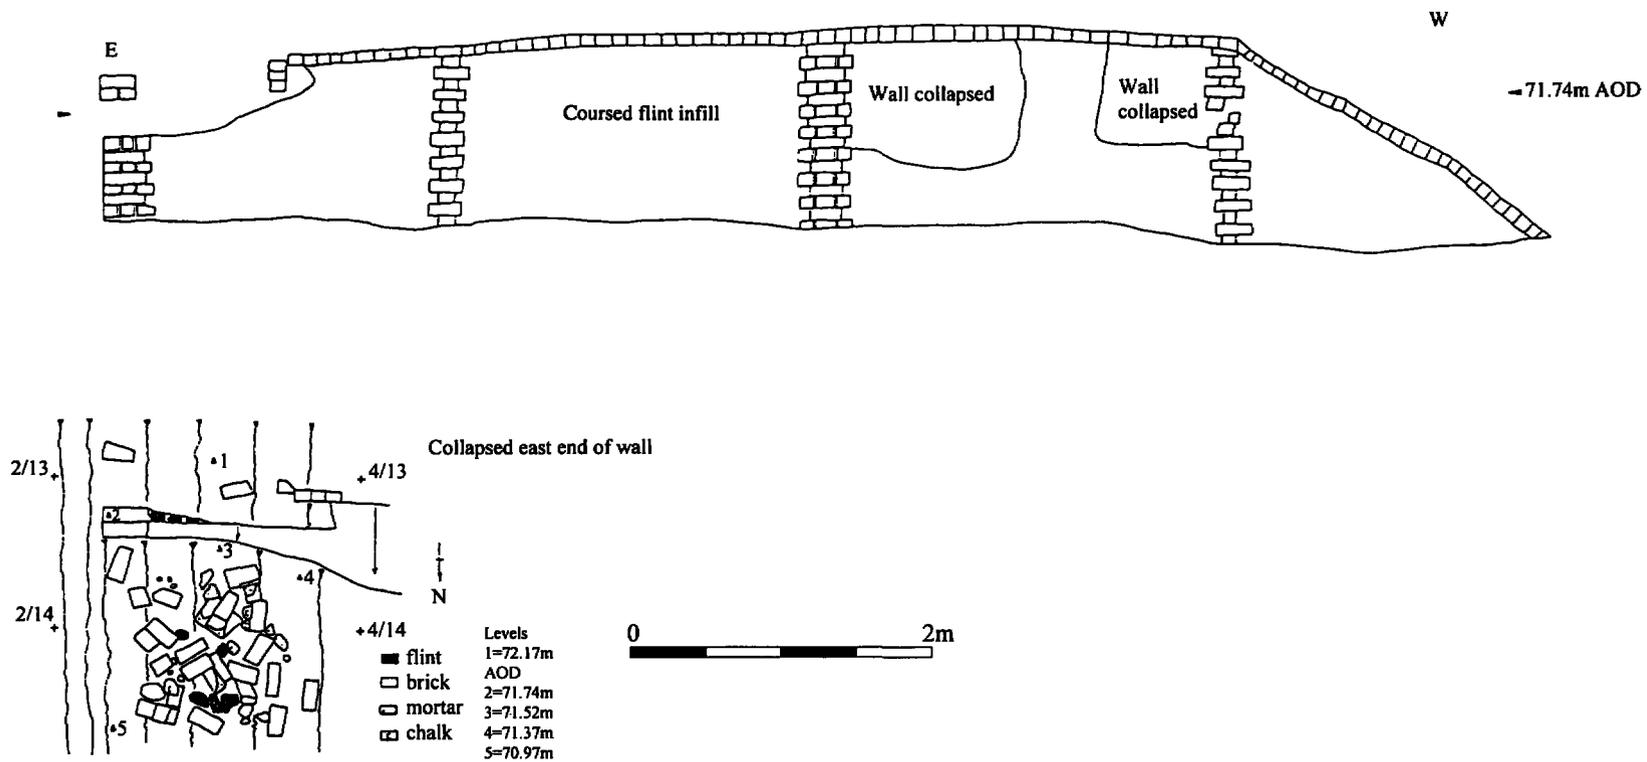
Elevation of the retaining wall, and plan of the collapsed east end of the wall
